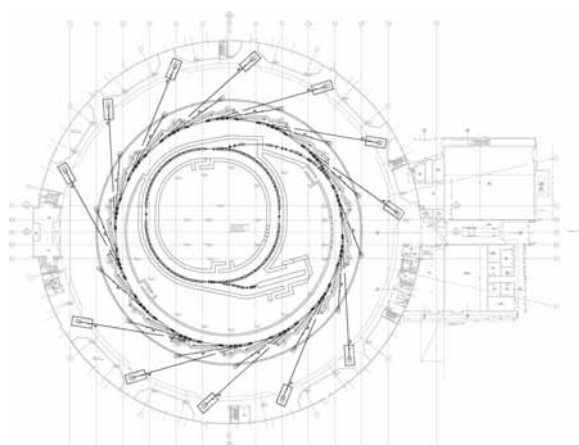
Floorplan of the building with an initial 12 beamlines in place.
